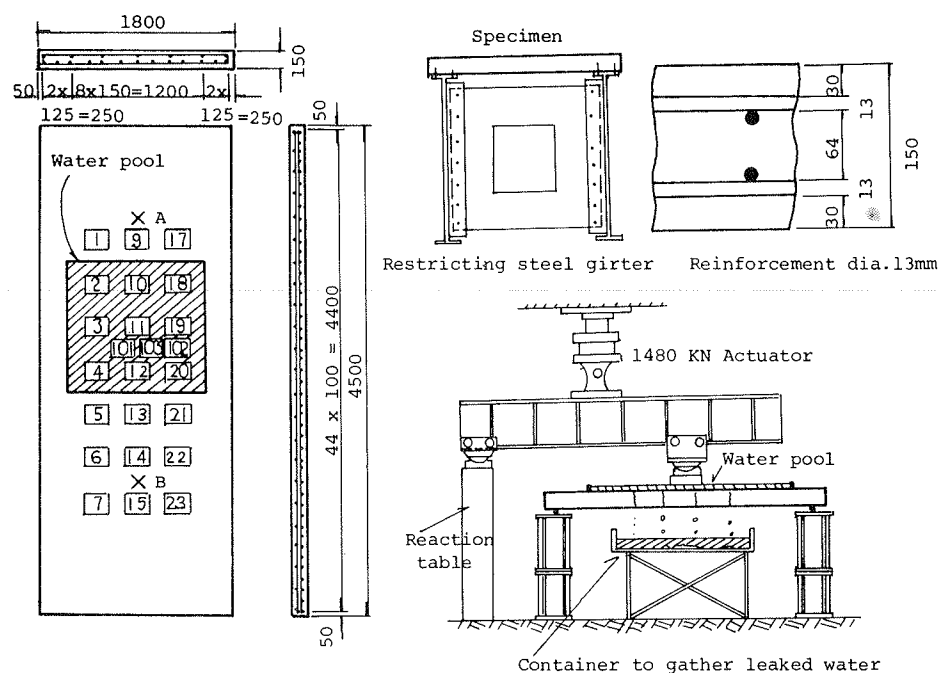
Shape of specimen, loading points, and loading apparatus.
